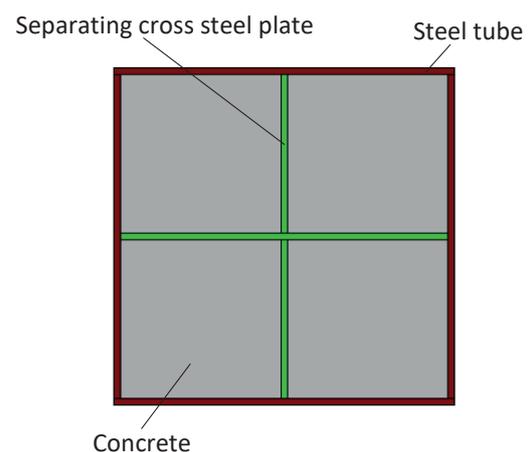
Cross section of concrete-filled steel tubular column with separating cross steel plate
